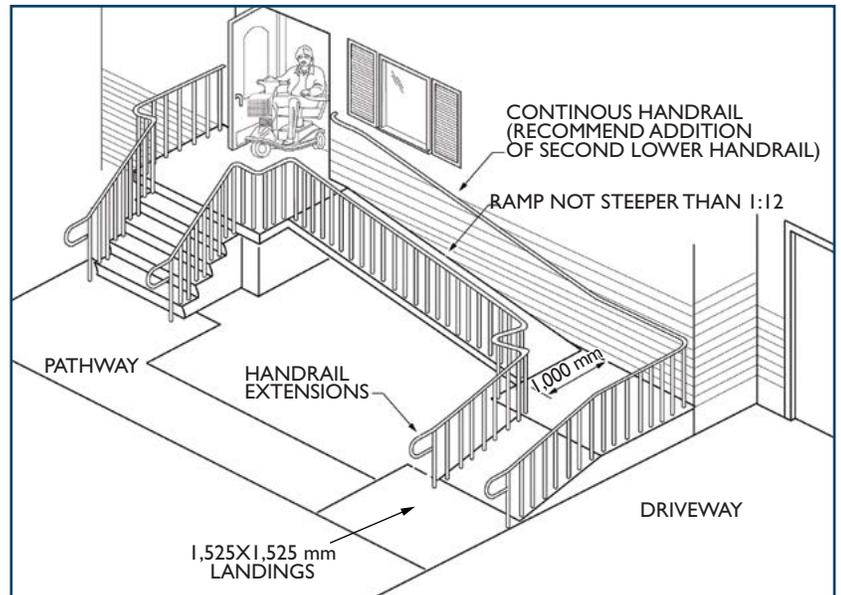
L-shaped ramp (site-constructed concrete ramp)
